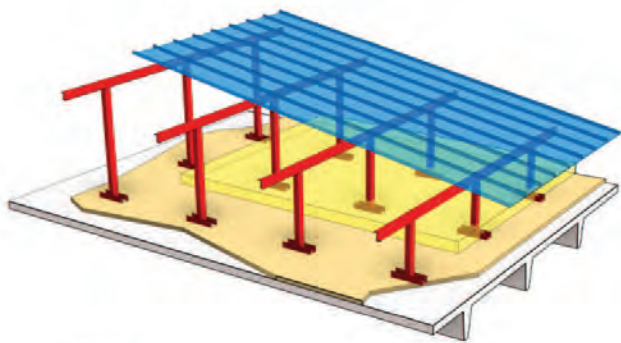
Concrete Tee Beam Roof – Parallel Application
